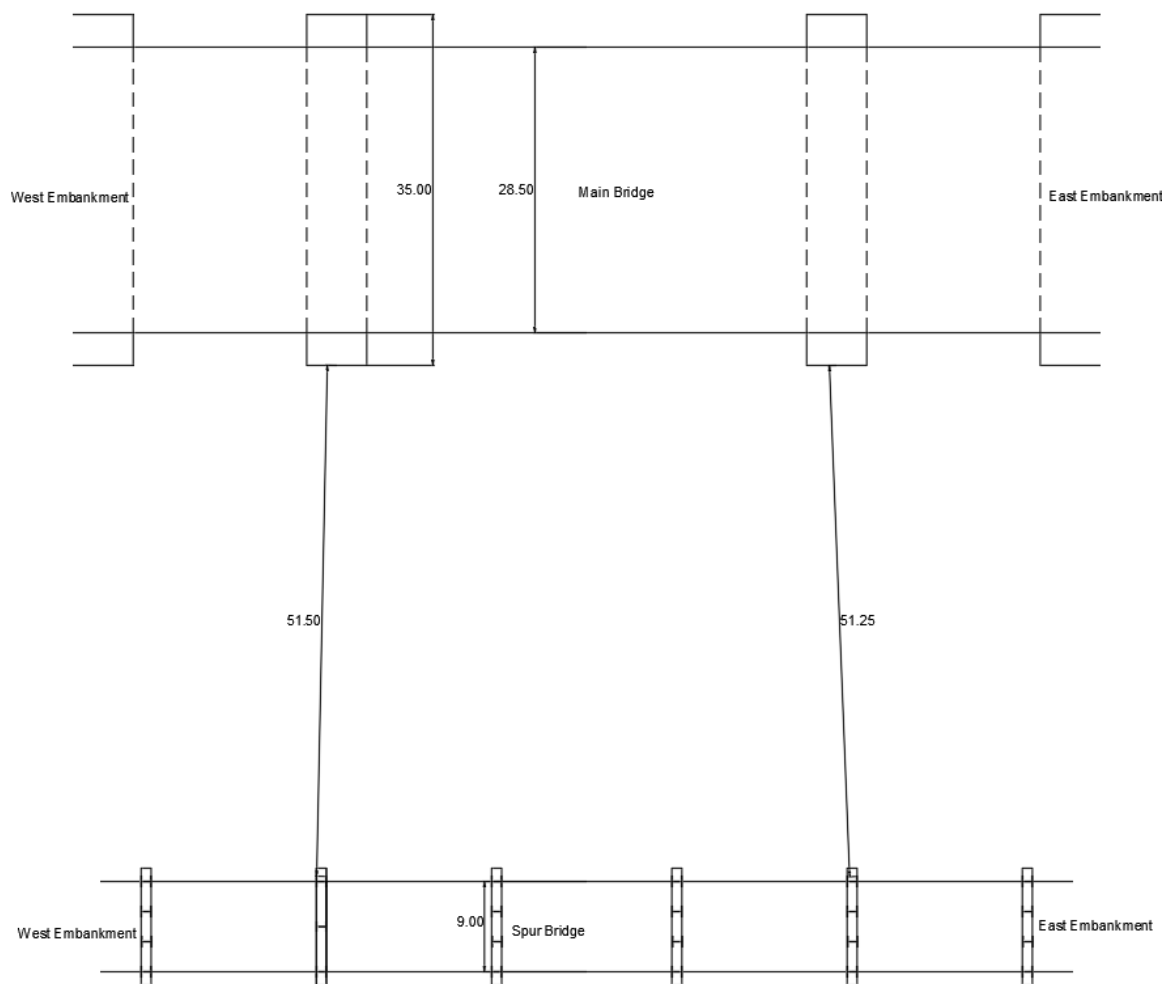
Plan view showing bridge decks and spacing between bridges. Note that the decks do not include walkways.
